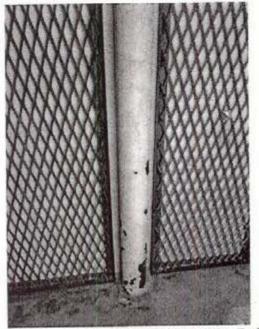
Lead bulk paint sample 120612-WWA-Bulk-P2 collected from pipe in Vault #1 (Room 005).
